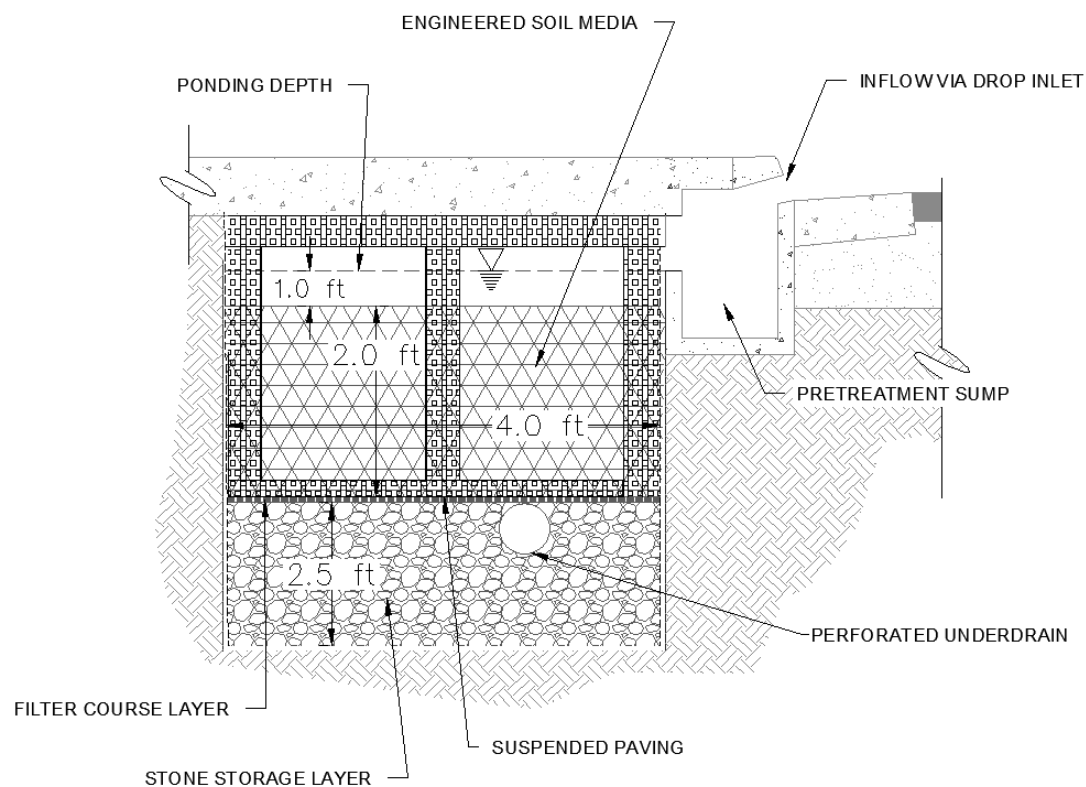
Green street suspended pavement biofiltration section with partial retention.
